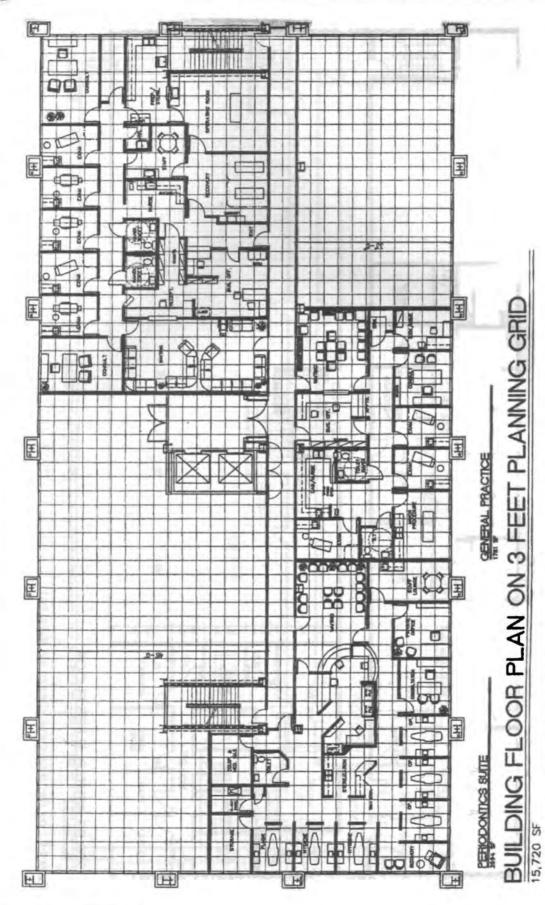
, Floor plan, building shell, using a 3-foot planning module. (Design: Jain Malkin Inc.)
